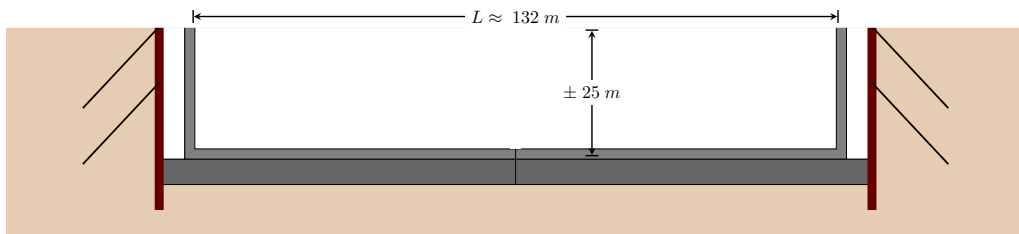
Schematisation of a building pit with an underwater concrete floor
